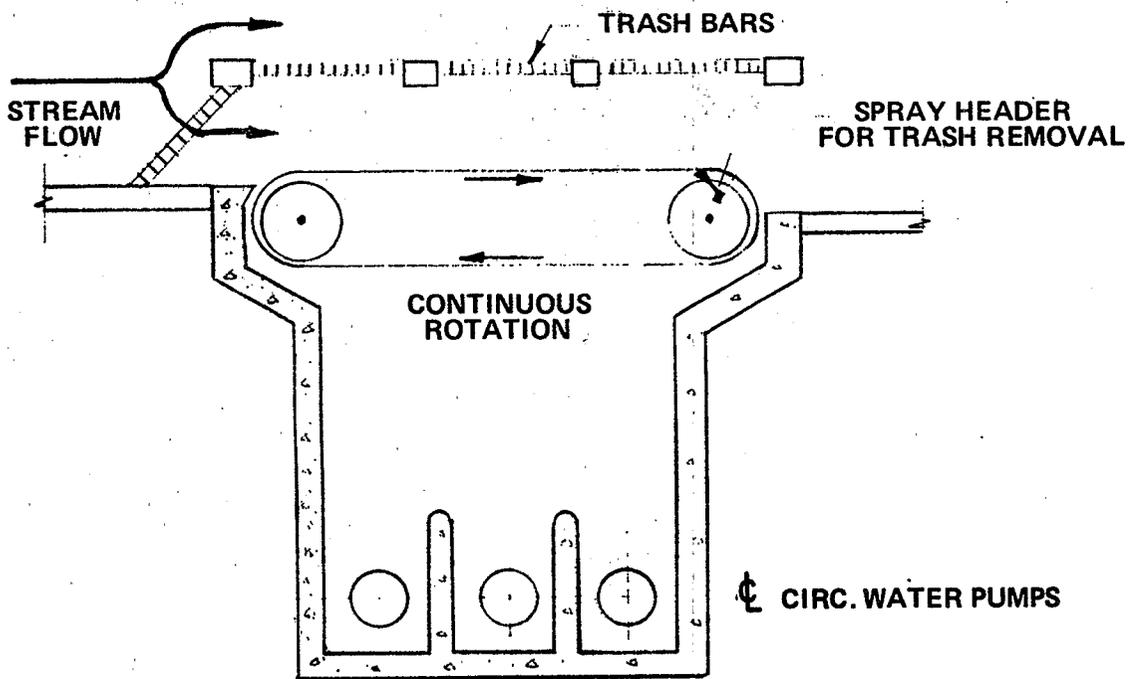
SCHEMATIC PLAN ADAPTATION OF HORIZONTAL TRAVELING SCREEN
